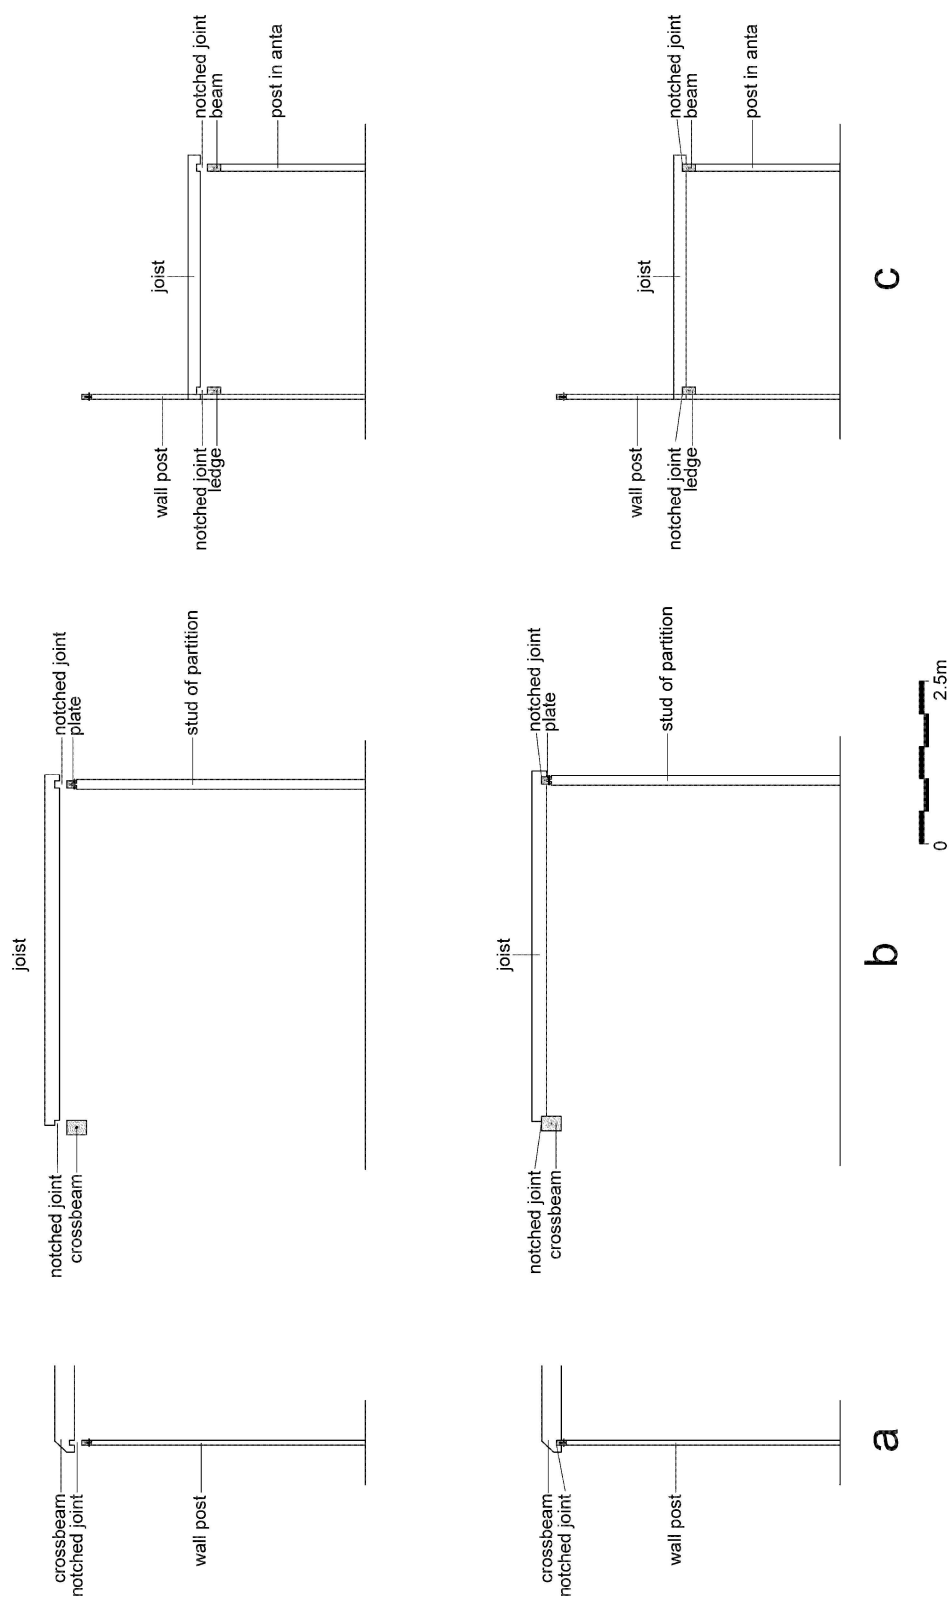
Reconstruction of (a) the sitting of a crossbeam on the plate of the wall posts using a notched joint; (b) the sitting of a loft joist on the crossbeam and on the plate above the studs of the partition in the ER by means of notched joints; (c) the sitting of a mezzanine joist on a beam across the front of the SRs (right) and a ledge (left) using notched joints.
